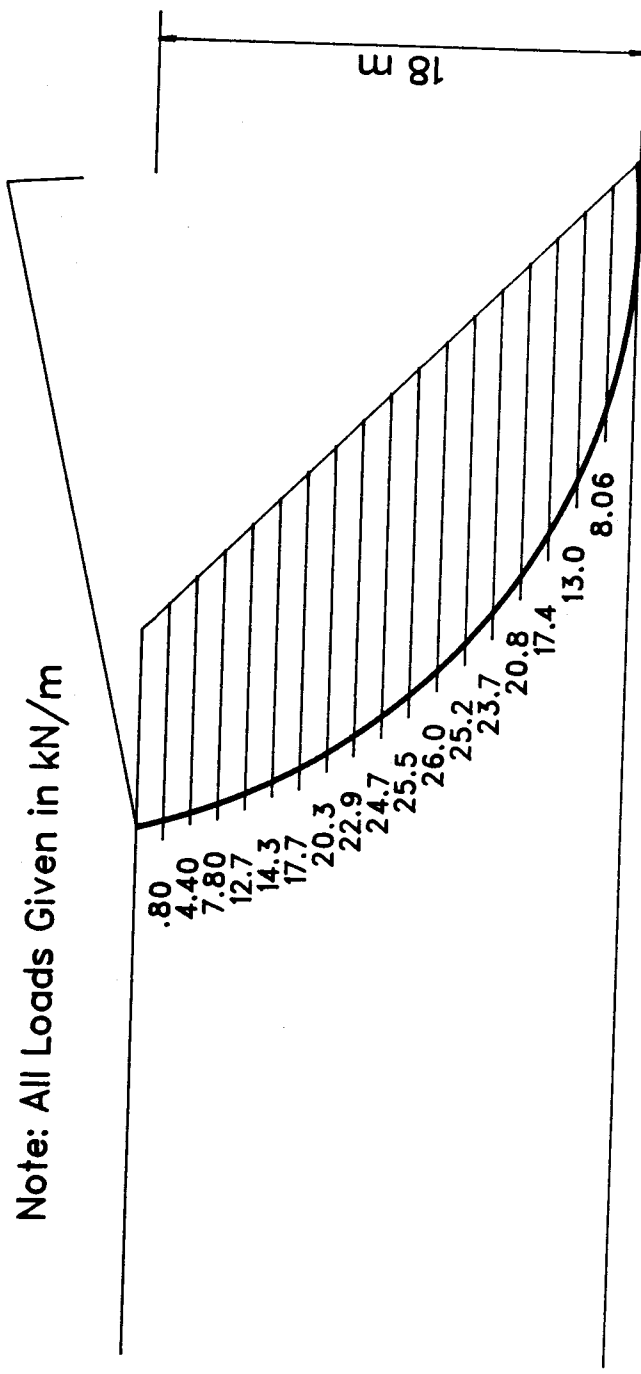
Potential Reinforcement Load Distribution for a Slope Height of 18 m
